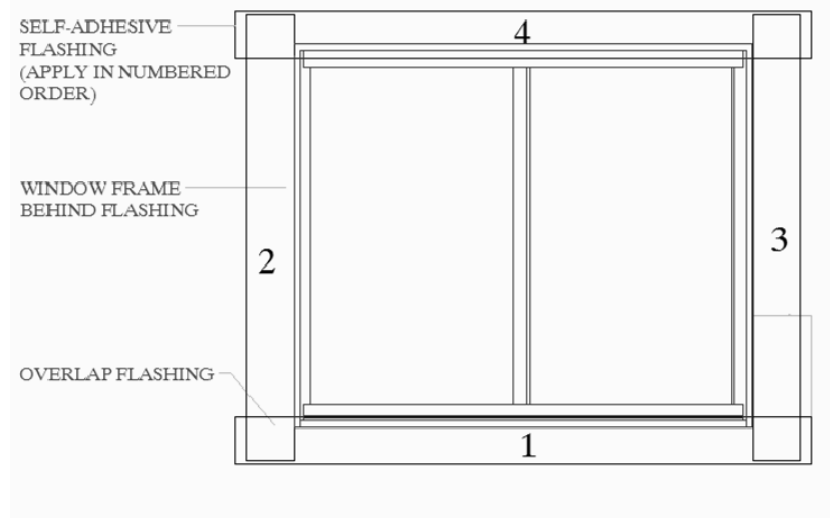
Replacement Window Self-Adhesive Flashing Detail
